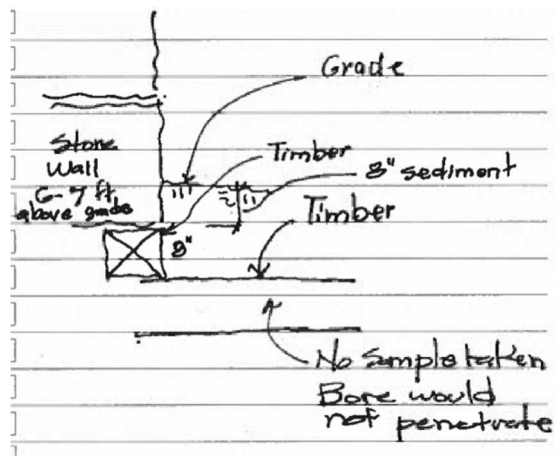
A field sketch of the timber at the face of the wall was prepared to show how the cross timbers run underneath
